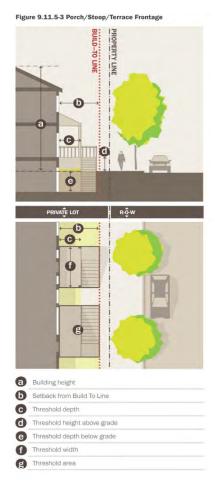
Podium Porch/Stoop/Terrace Building Frontage
